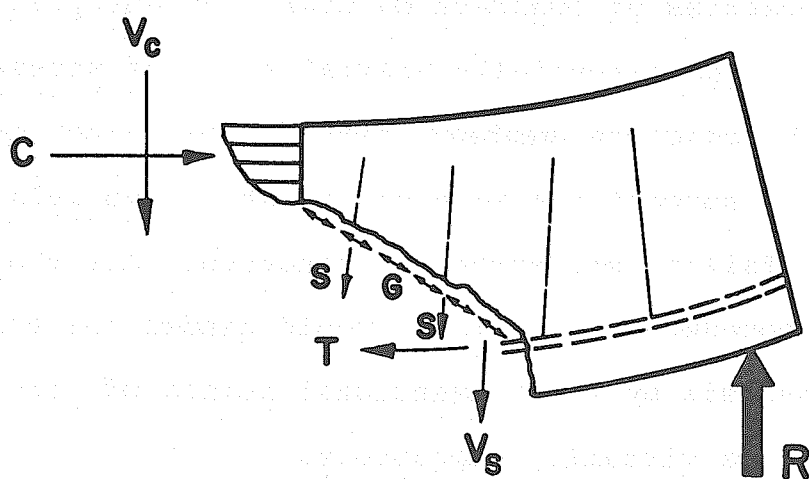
SECTION IN COMBINED BENDING AND SHEAR
